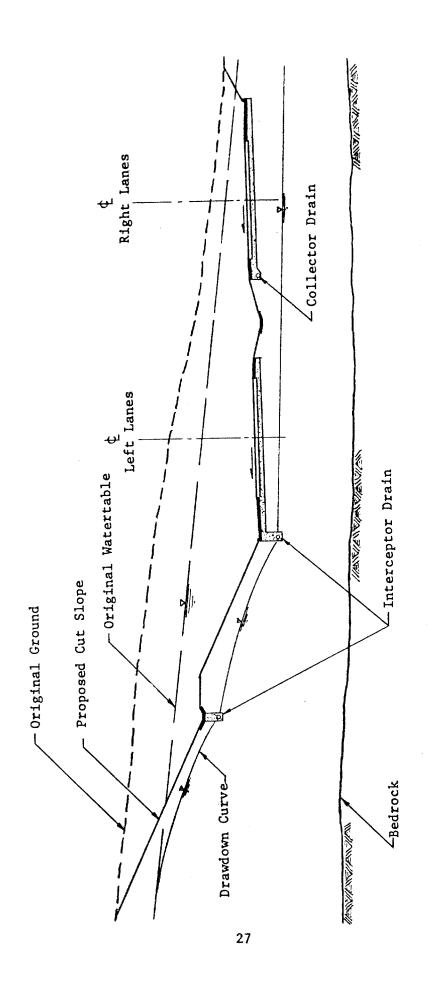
Multiple, Multipurpose, Longitudinal Drain Installation.
